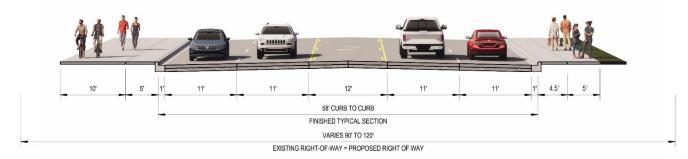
Pavement Replacement as a Wider 5-Lane Facility with Terrace and Sidewalk (County A to the Proposed Location of Olympus Road), facing north
